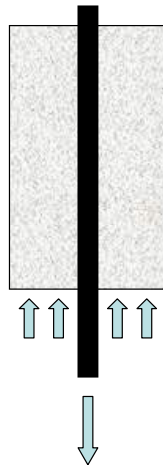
Schematic of pullout test (adapted from ACI 408)
